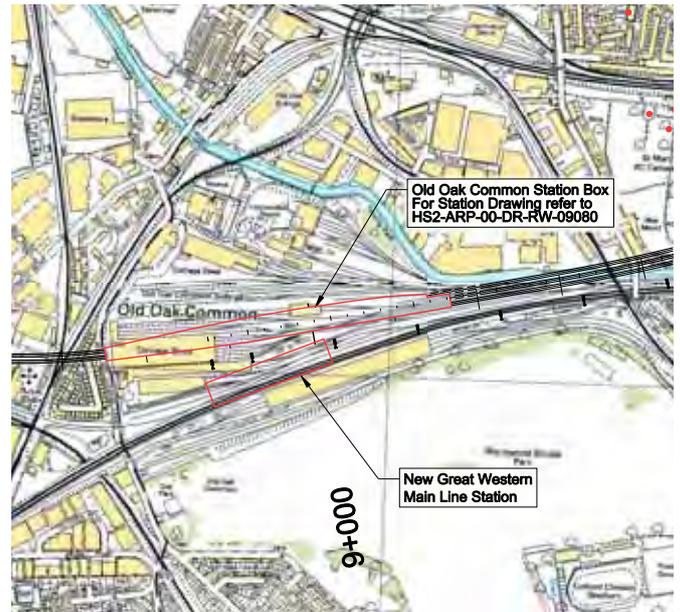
Proposed lay-out of Old Oak Common Station
